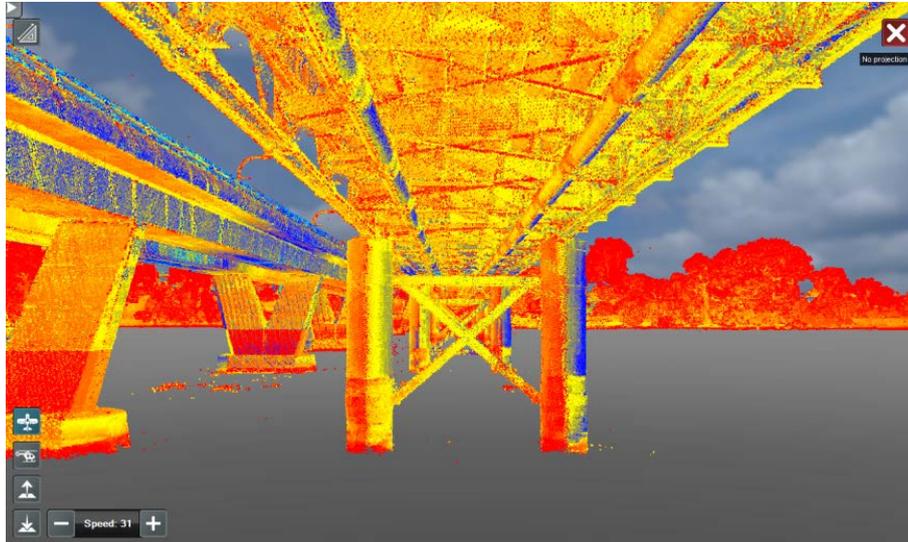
Measurement under the deck of Shoalhaven Bridge.
